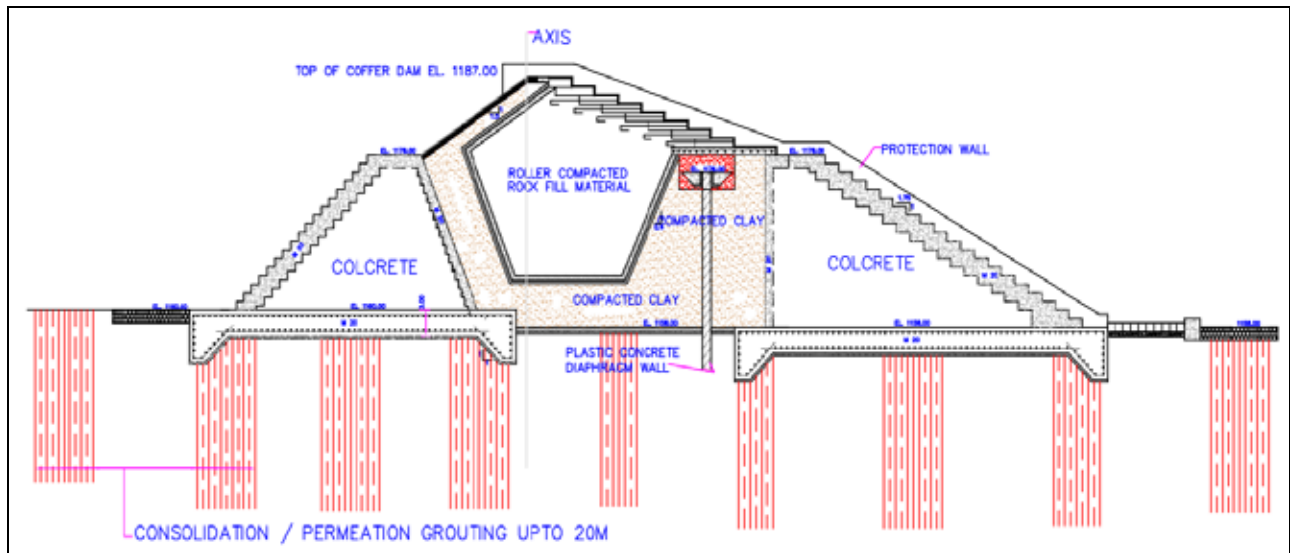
Maximum Section of Upstream Cofferdam at centre (colcrete type) with clay and plastic cut off wall
